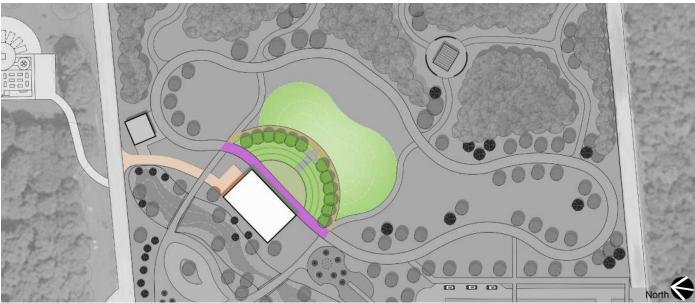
Master Plan Concept Design for outdoor Amphitheatre seating and Pavilion Improvements
